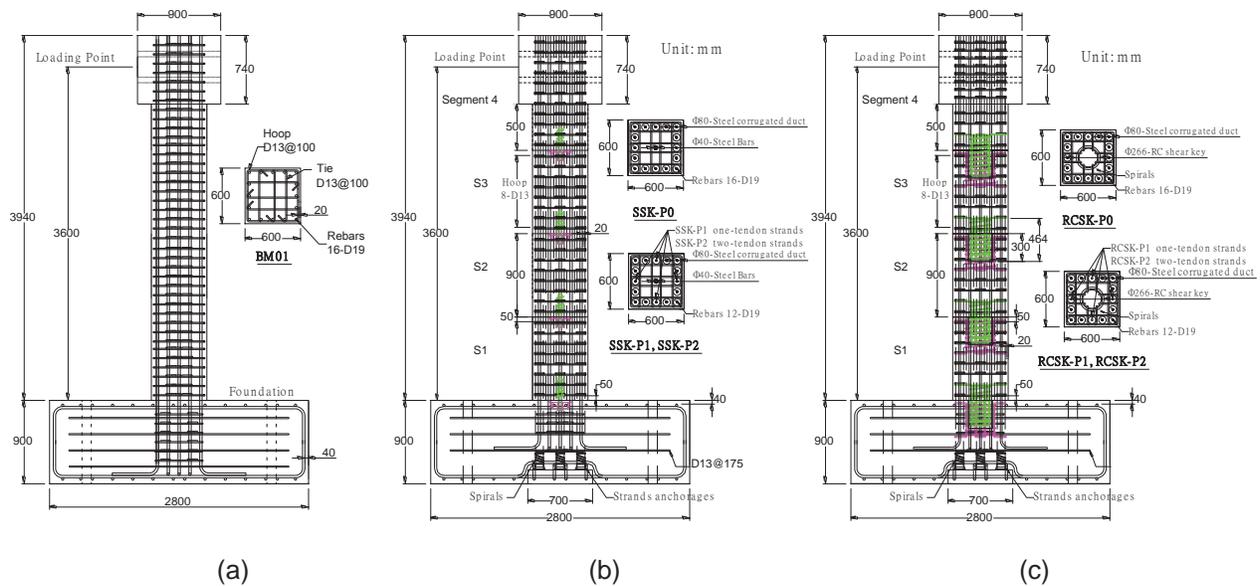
Design details of specimen: (a) specimen BM01; (b) specimens SSK-P0,P1,P2 (c) specimens RCSK-P0,P1,P2
